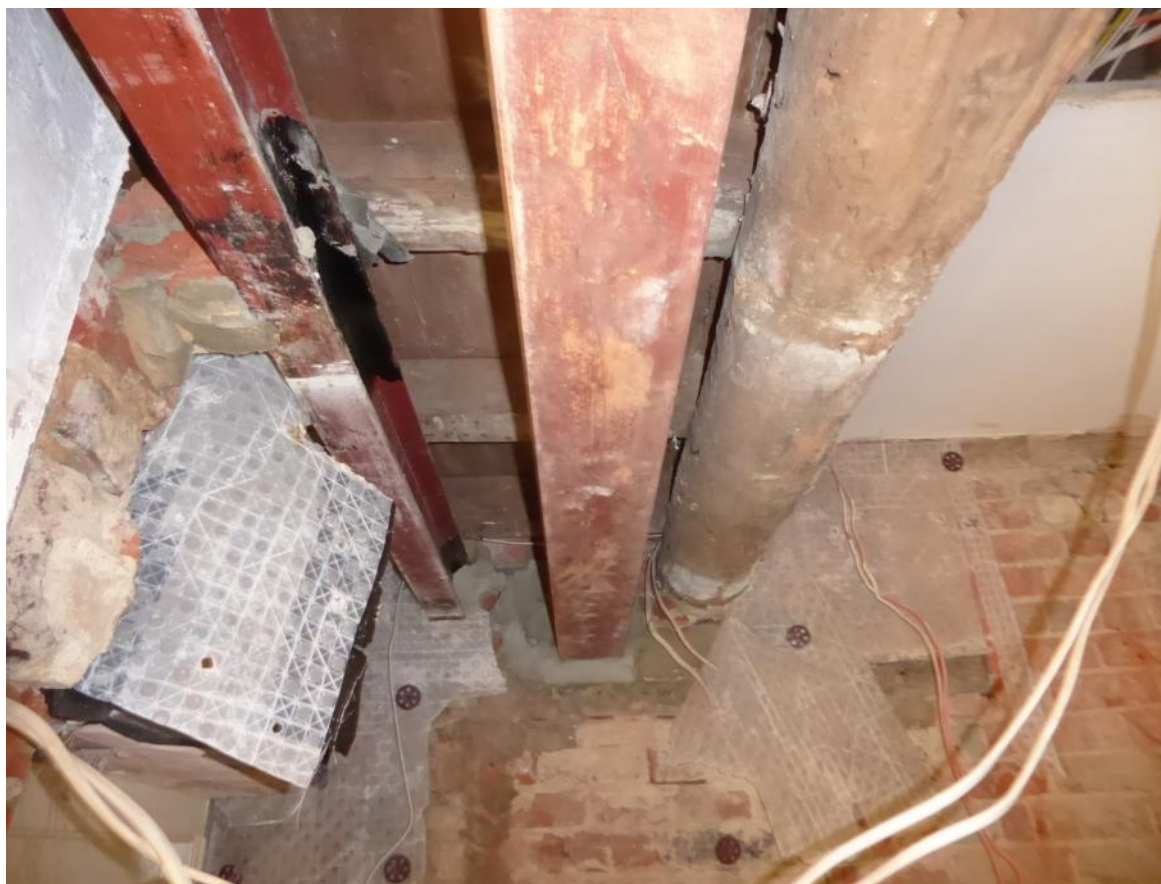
; beam arrangement in ceiling of room 4.2
